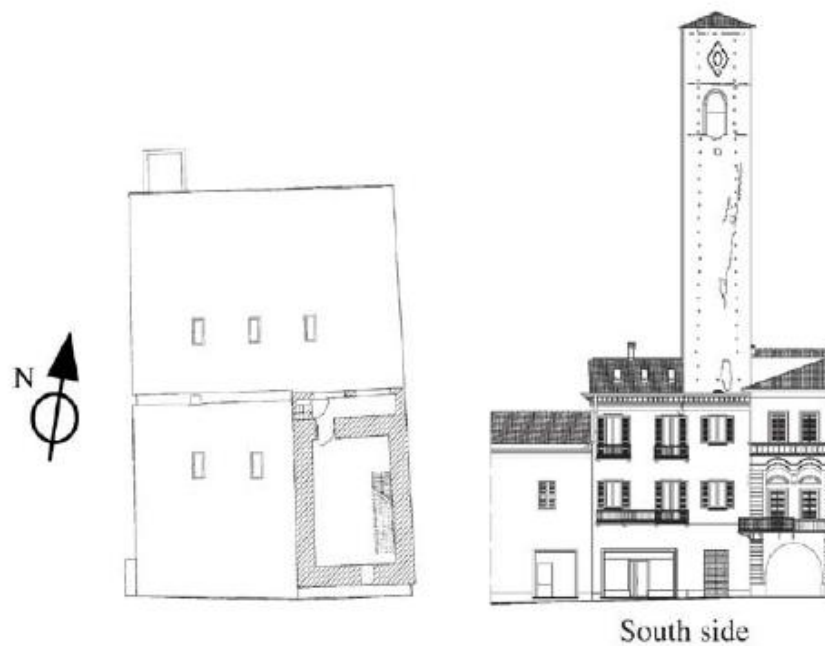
Torre Astesiano. Plan and elevation view of the tower. Notice the presence of the main crack in the upper part of the tower.
